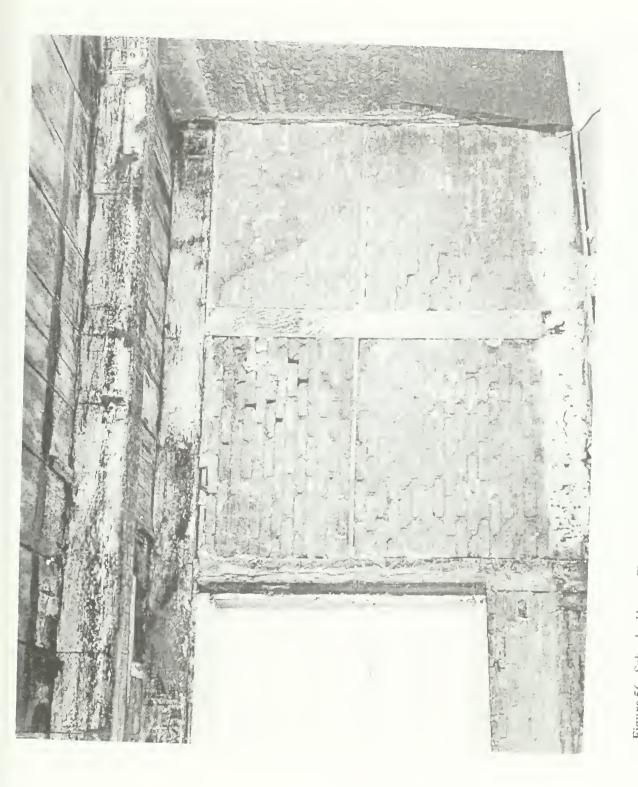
Schuyler House: First story of kitchen wing after ca.-1815 lath and plaster removed; north end of west wall in location of ca.-1780 storage room (1958). Window at left was originally a ca.-1780 exterior doorway.
